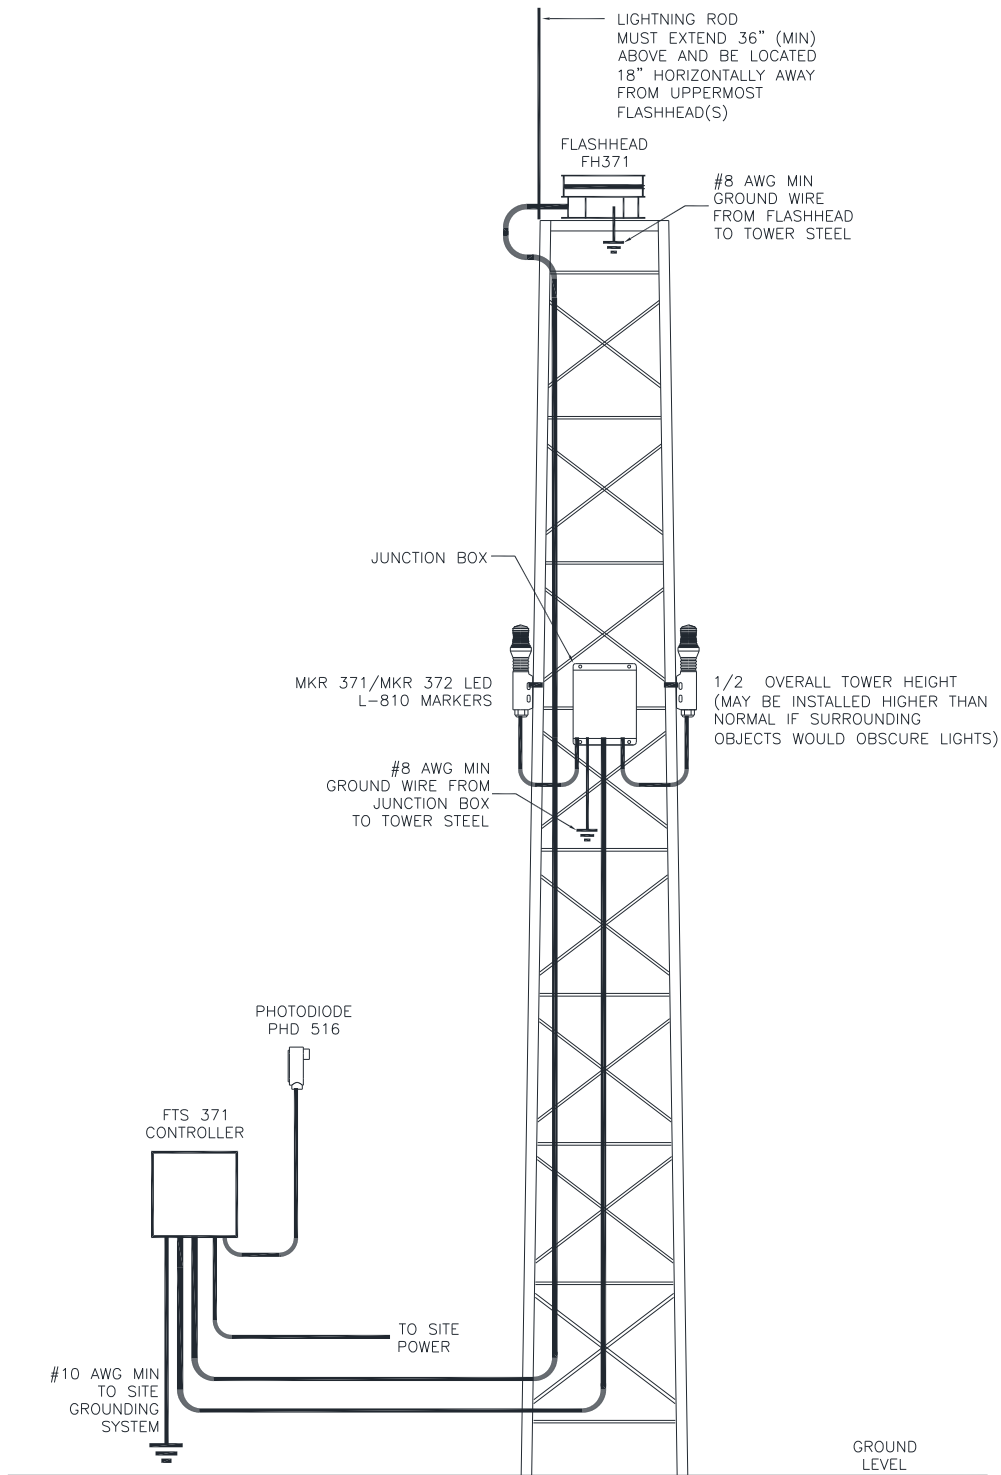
FTS 371 AC Typical FAA Type A1 Installation Wiring
